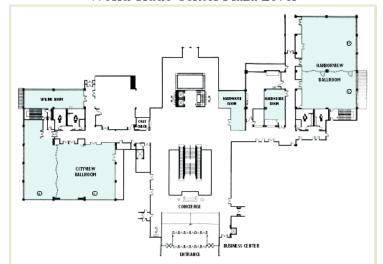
Seaport Hotel and World Trade Center Floor Plan
